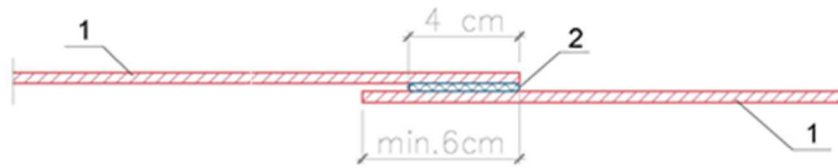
LONGITUDINAL CONNECTION OF MEMBRANE STRIPS – VIEW
